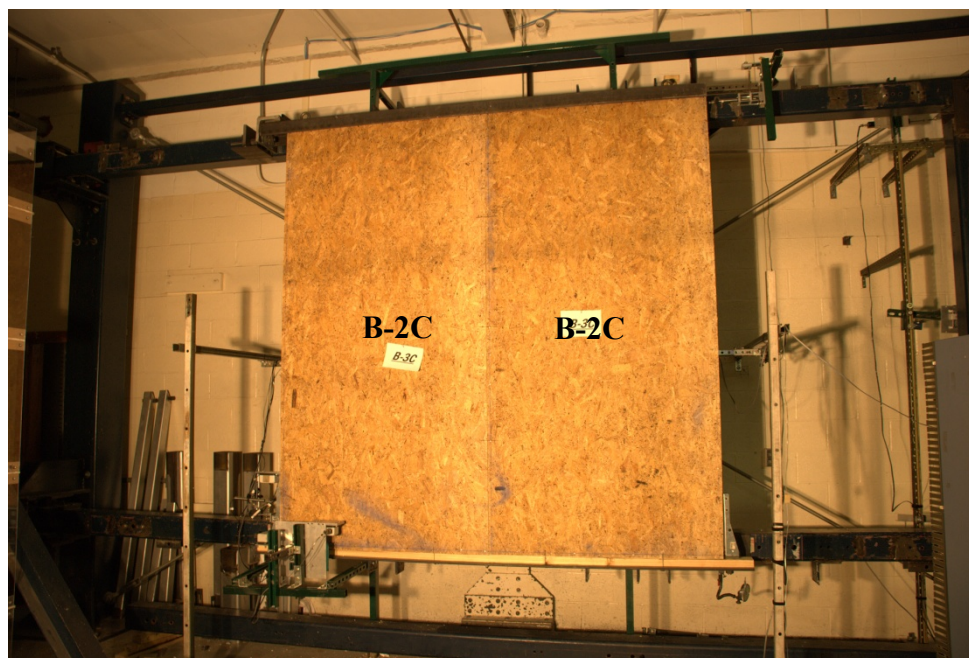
Specimen B-2C on test facility prior to cyclic loading
